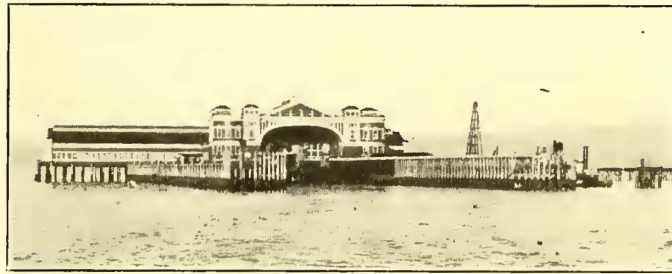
BOAT SLIP AND PIER AT FERRY DEPOT
